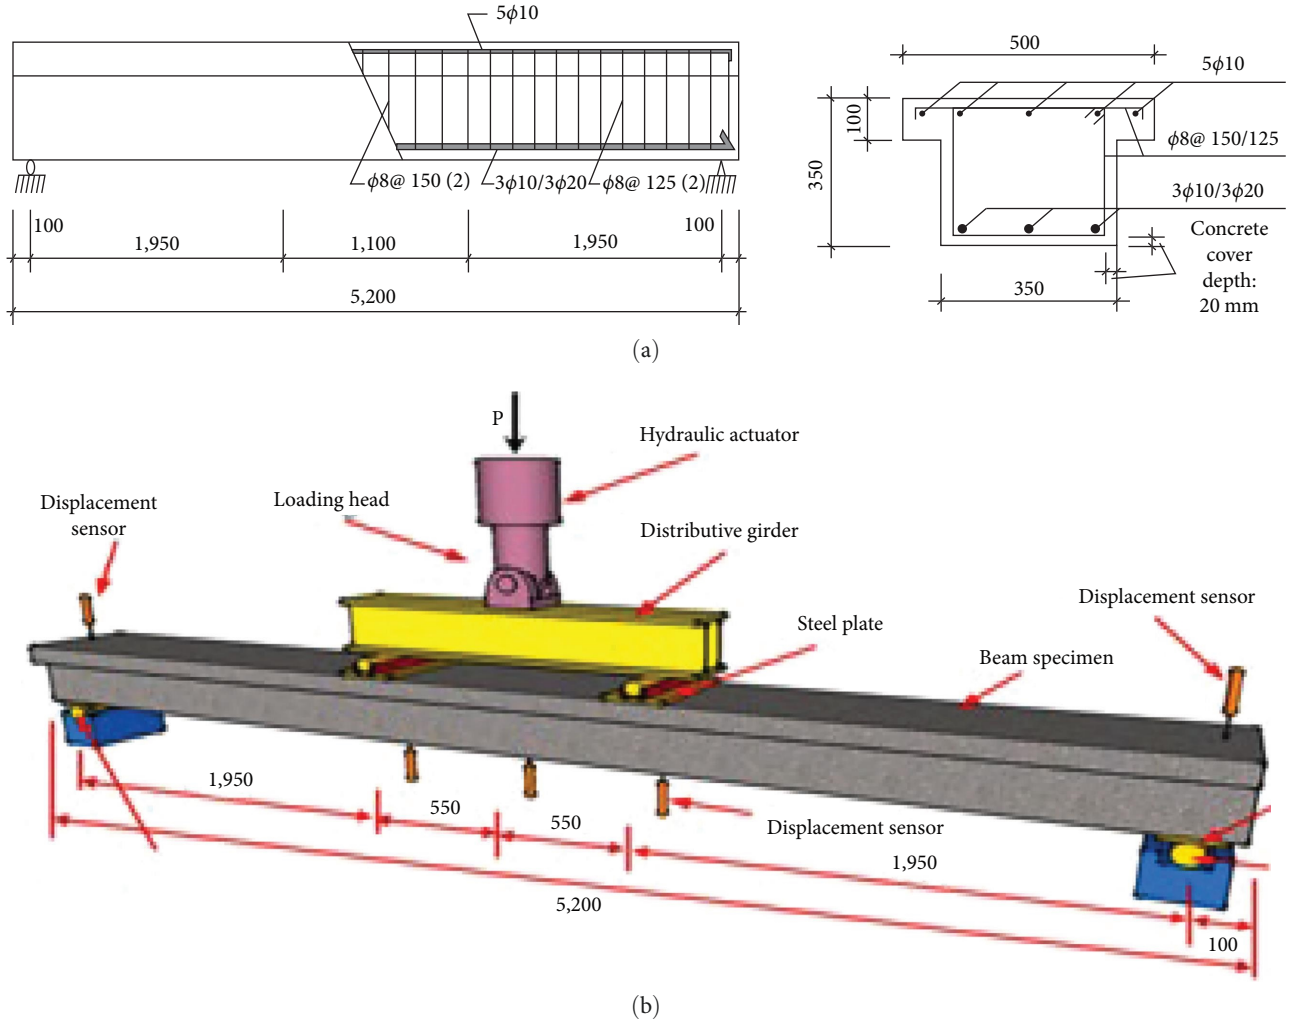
Geometry, boundary and cross-section detail of control specimen [3]. (a) Detail and (b) laboratory setup.
